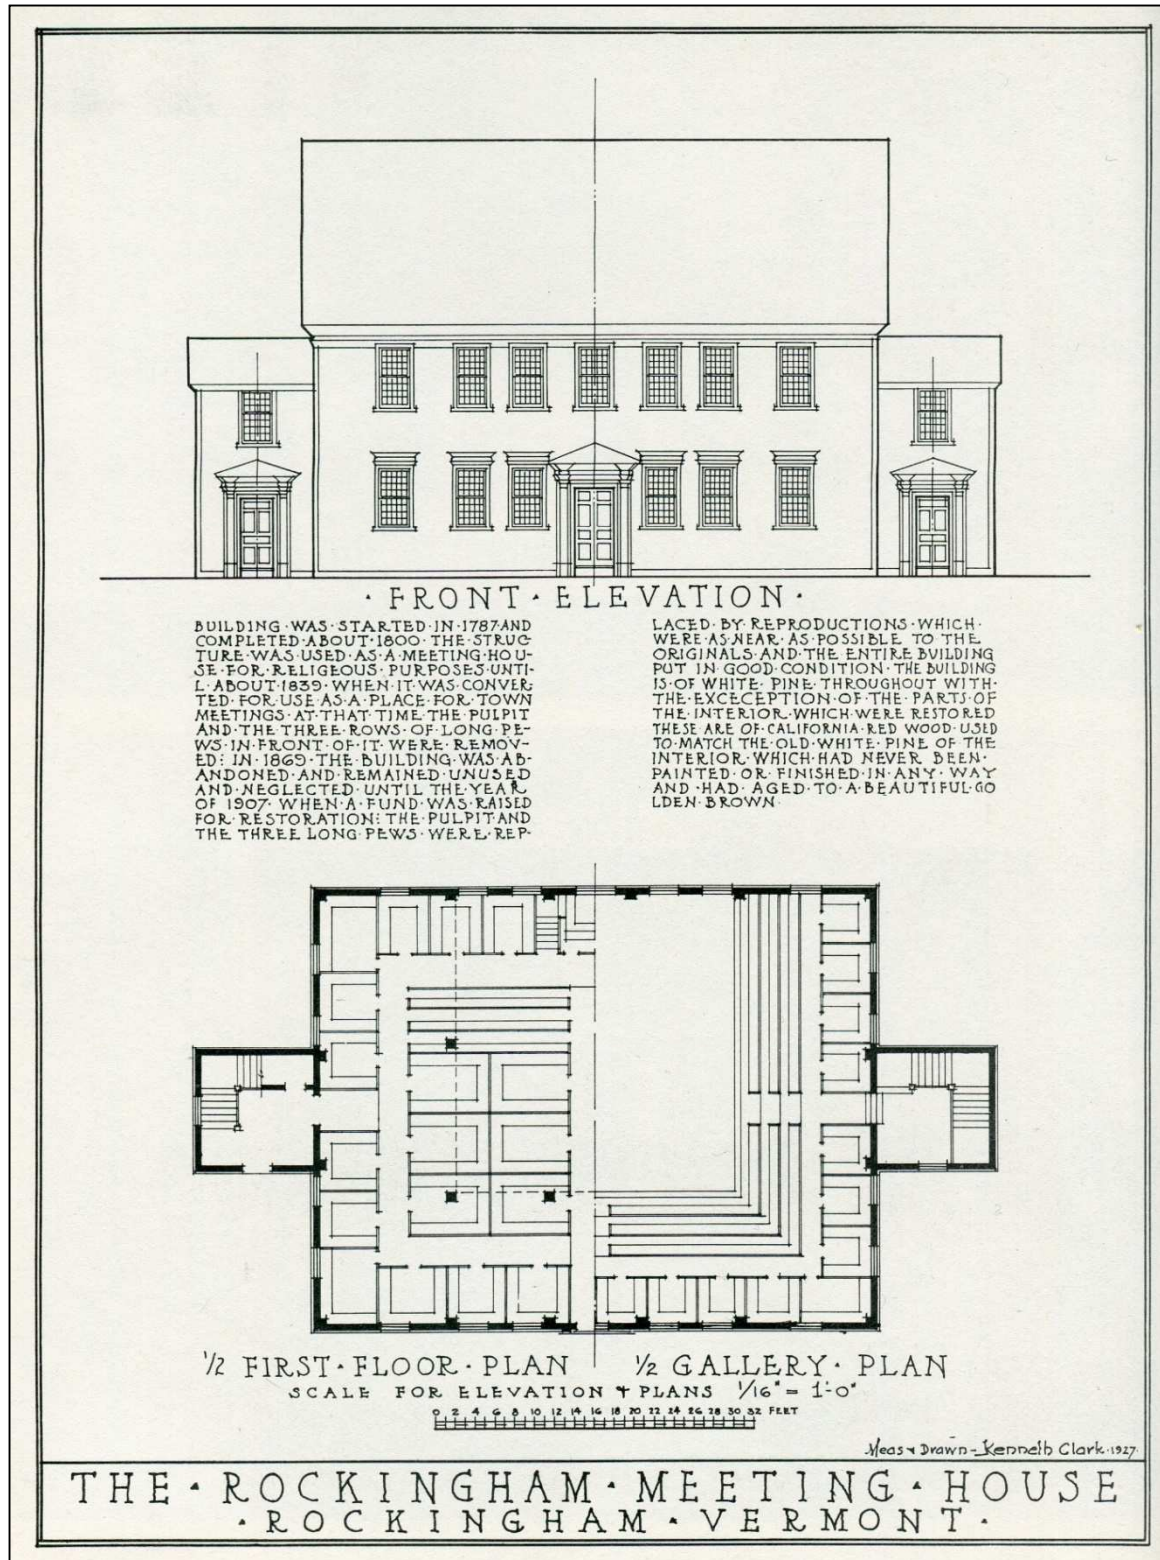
Front Elevation and Floor Plan of the Rockingham, VT Meeting House (*Colonial Architecture in New England*, 64)
